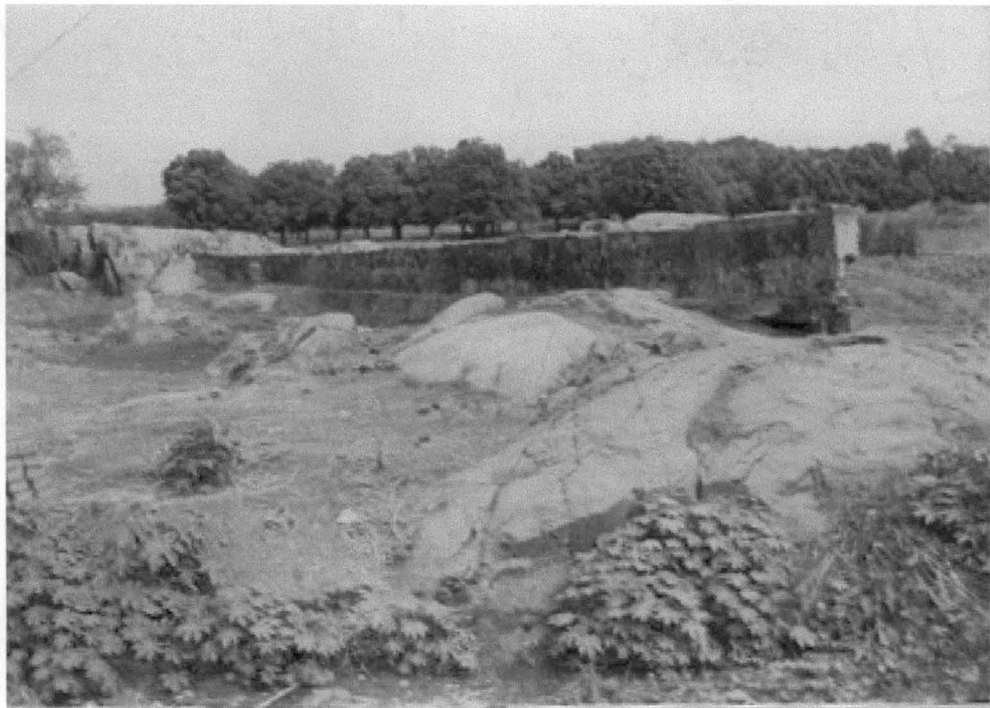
(b): The back view of concrete dam constructed in the 60's which has be deforested and water no longer flow over the dylce.
